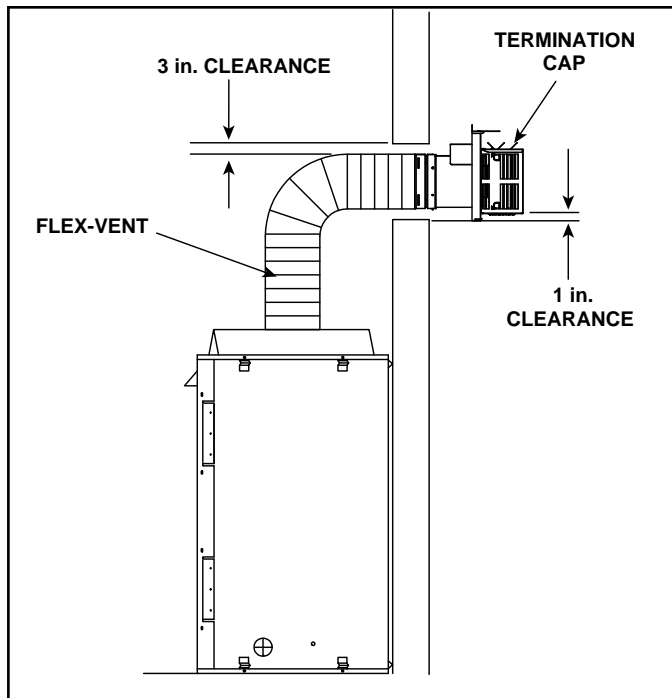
Flex Vent Pipe - Generic Fireplace Shown
